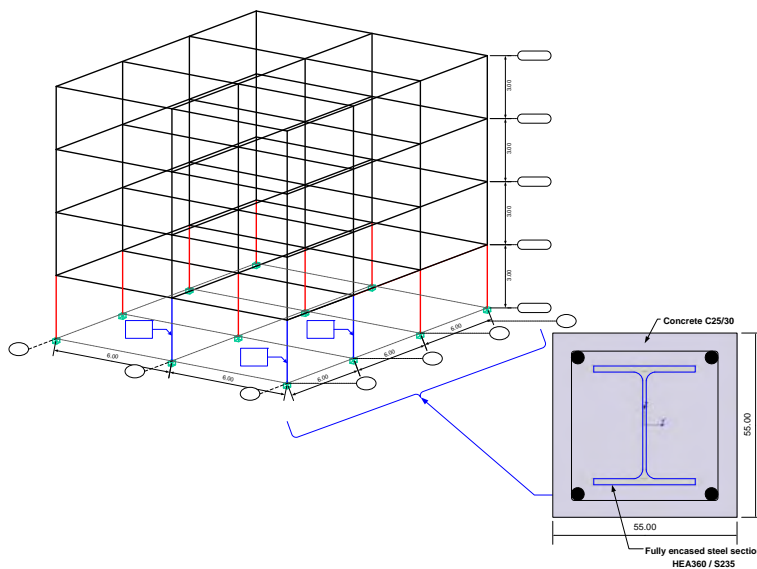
Location of the damaged columns and the composite steel-concrete section of the ground-floor columns
